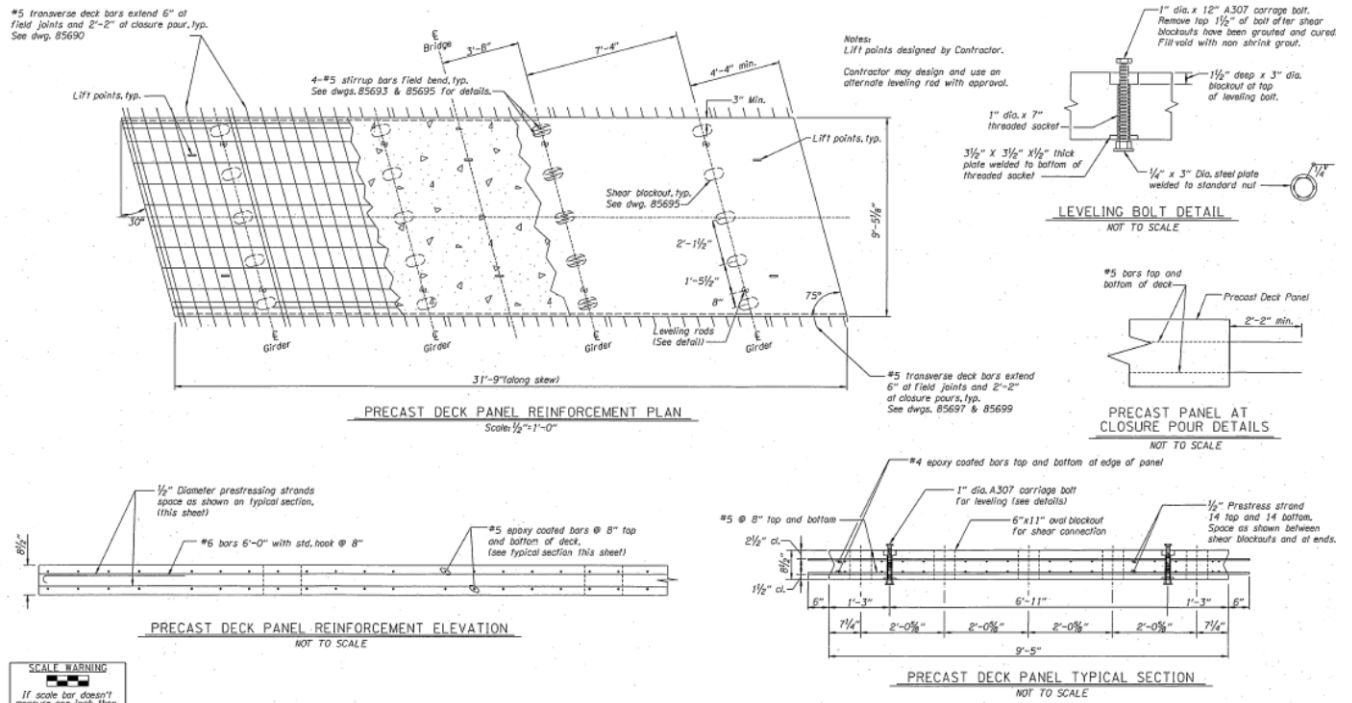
Diagram. Bridge 21252 precast deck panel details.
